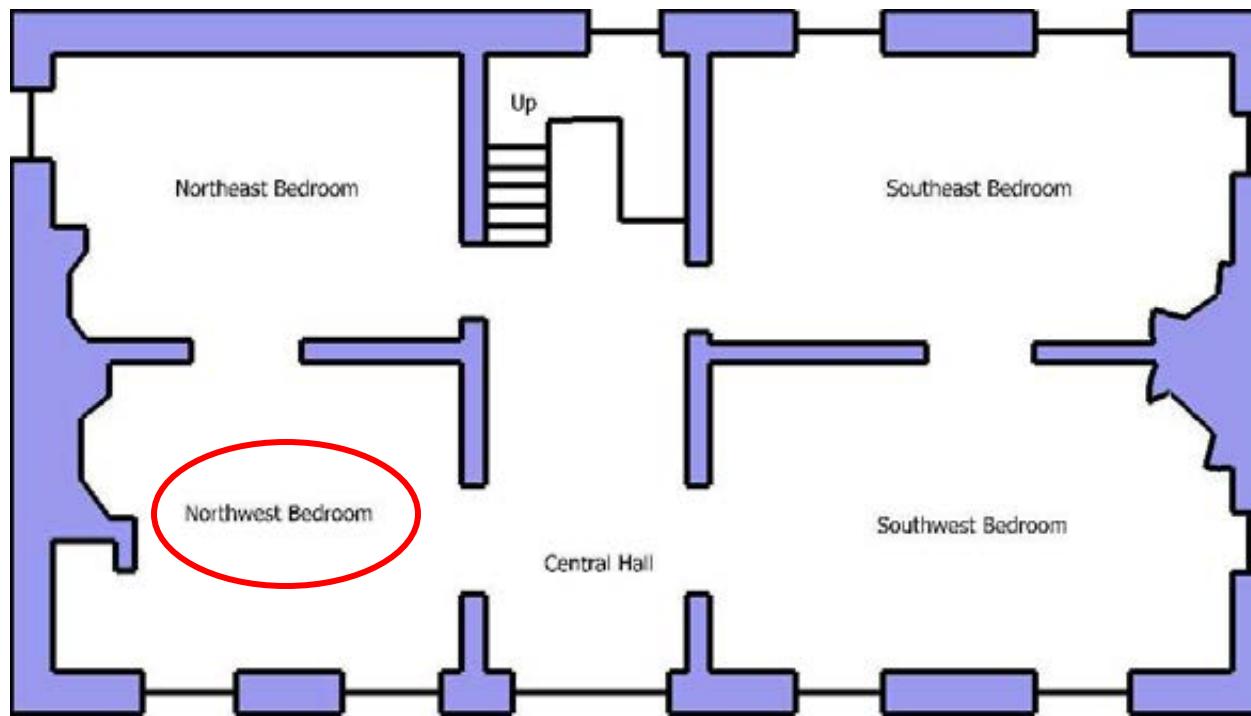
Plan showing the northwest bedroom on the second floor in the main block. Drawing by Kathleen Manicke.
